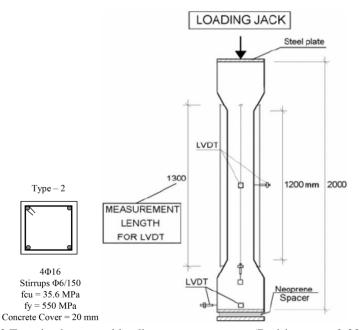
Tested columns and loading test arrangement (Rodriguez et al. 2007)
